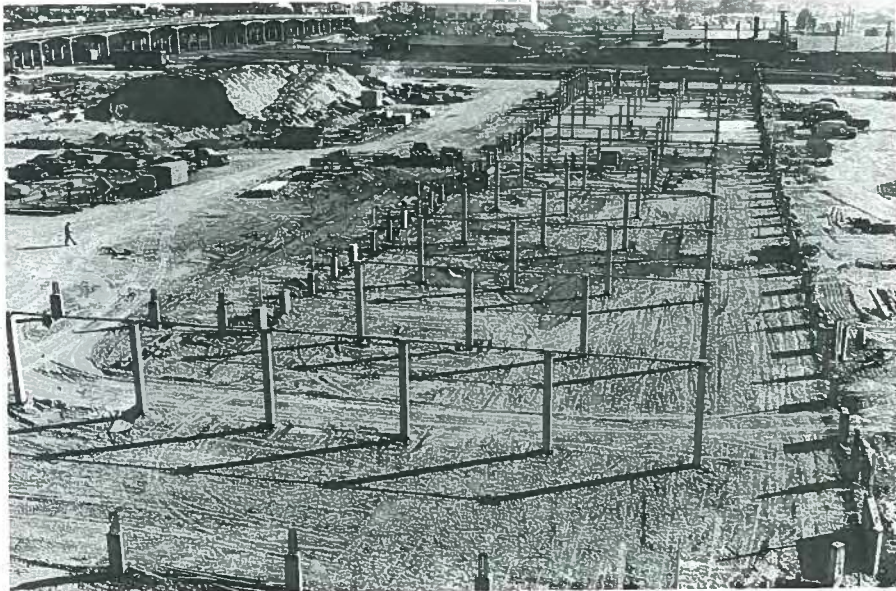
Aligned columns, all in place, await setting of girders. Outer wall footing piers are ready for column forms.
